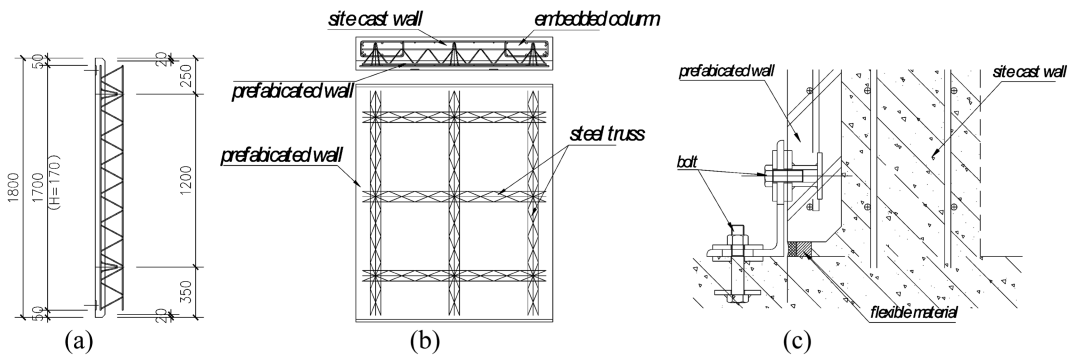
Construction diagram of steel truss (a) section of prefabricated part, (b) diagram of connection truss, (c) assemble method of the laminated wall
